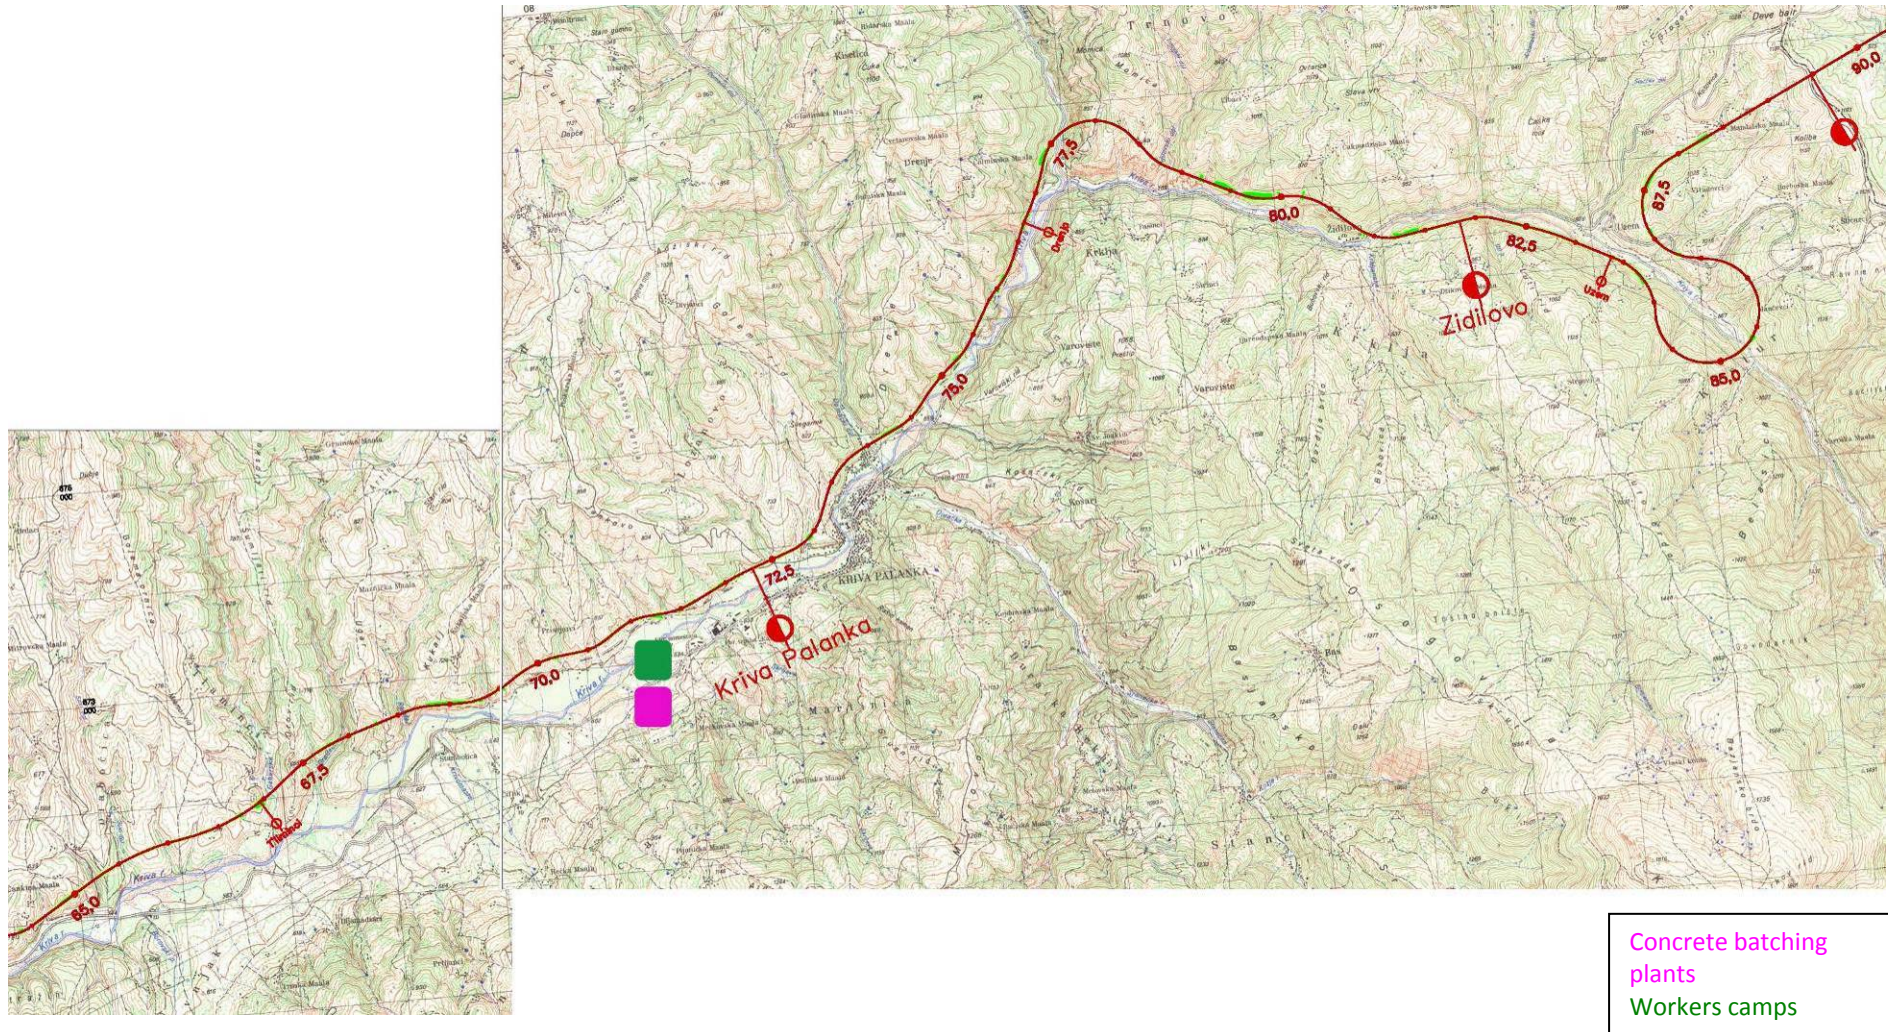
Location of Previous Workers Camp and Concrete Batching Plant in Section 3
